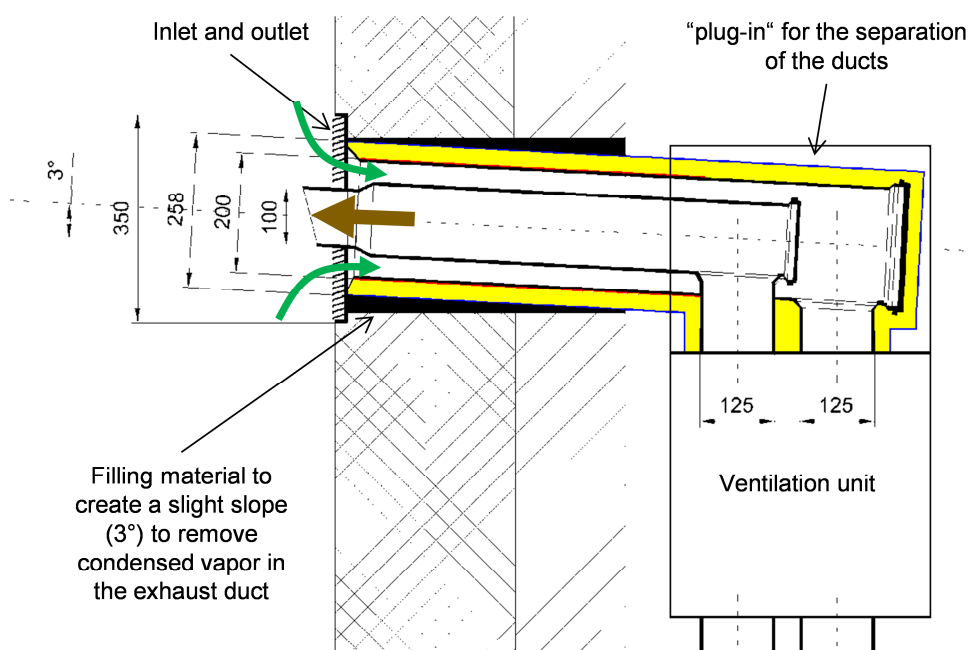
Sketch of the installation of the coaxial duct as outdoor air inlet and exhaust air outlet of the ventilation unit.
